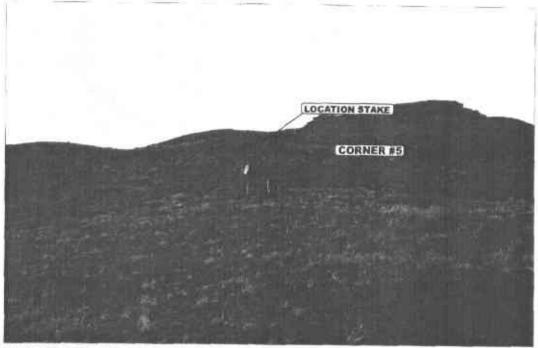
PHOTO: VIEW FROM LOCATION STAKE TO CORNER #5
